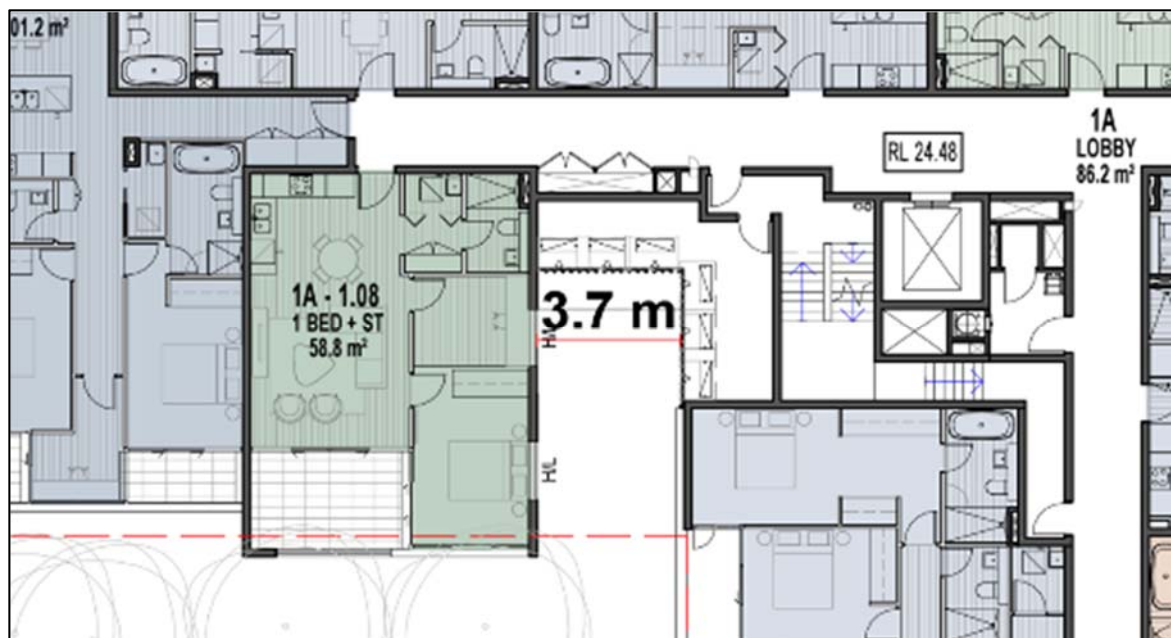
Building 1A Study window are in close proximity to banks of air conditioner units
